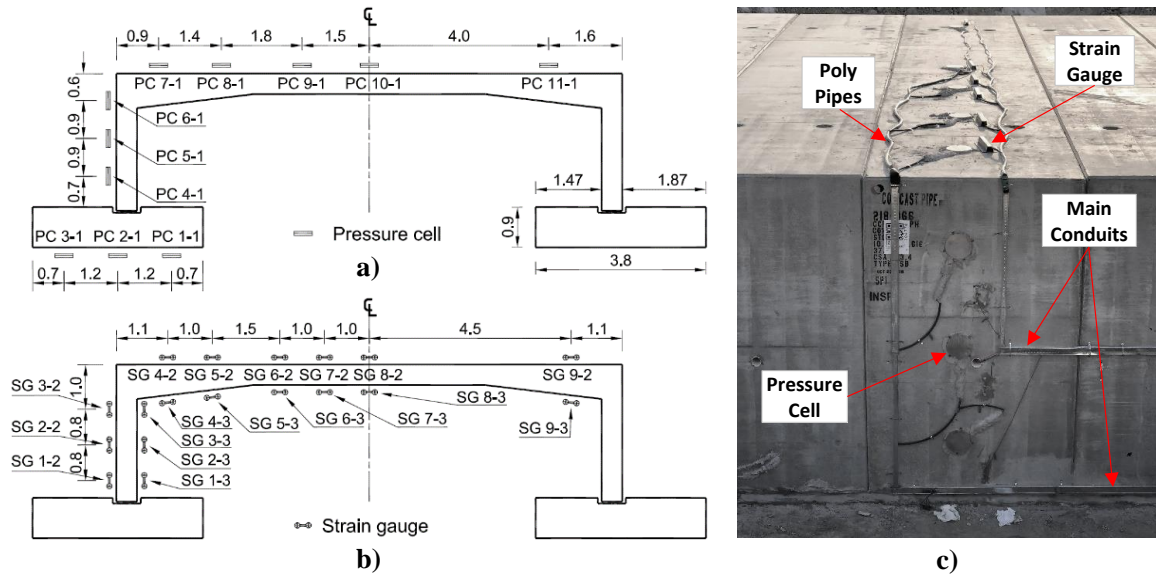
Pickering culvert instrumentation layout: a) pressure cells; b) strain gauges; and c) instrumented segment. (All dimensions are in m)
